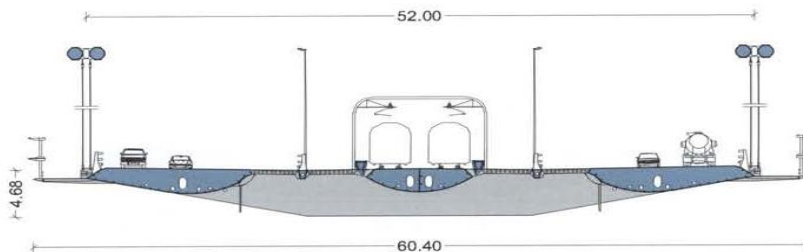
Cross Section of Deck (Stretto di Messina S.p.A 2009)
